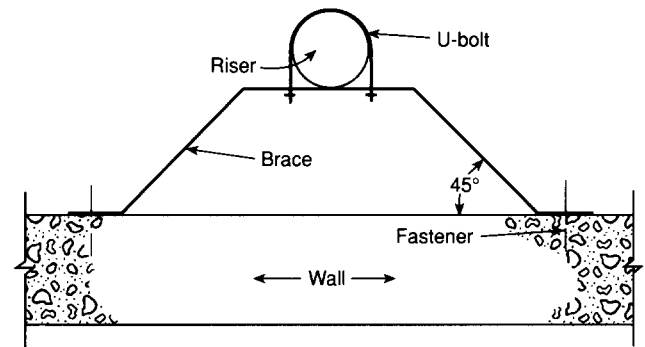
(e) Detail of four-way brace at riser.
